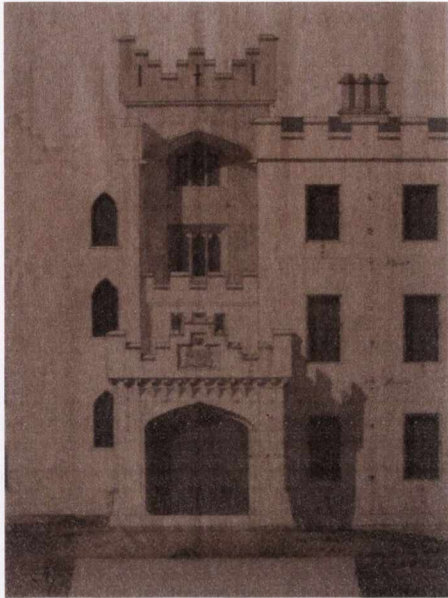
Killeen Castle, Co. Meath, detail of porte-cochère and central bay from proposed elevation of principle façade, [Aug. 1809], IAA, RIAI Murray Collection, 92/46.924, courtesy of the Irish Architectural Archive.
